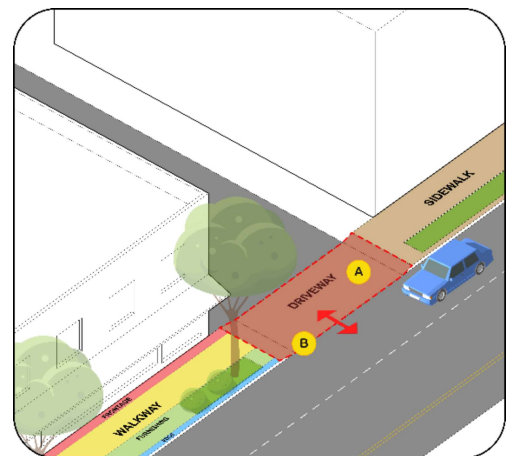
A-Shared driveway access between properties is encouraged. B-Driveways should emulate the material of sidewalk for continuity and should be at the same level as the travel lanes.
